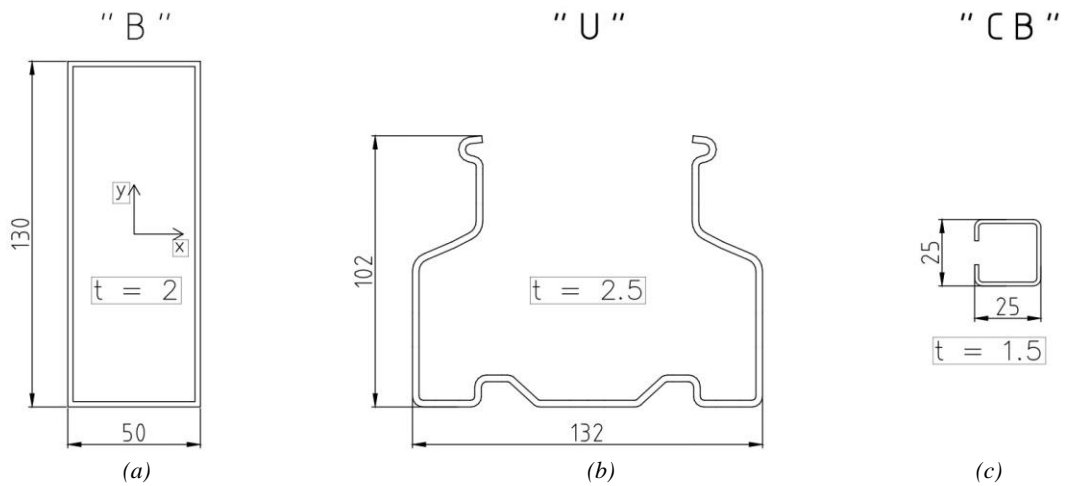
Cross-sections of beams (a), uprights (b), and cross-aisle bracing (c)
